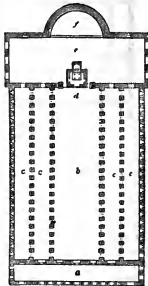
Ground-Plan of St Paul's, Rome, before its destruction by fire.
